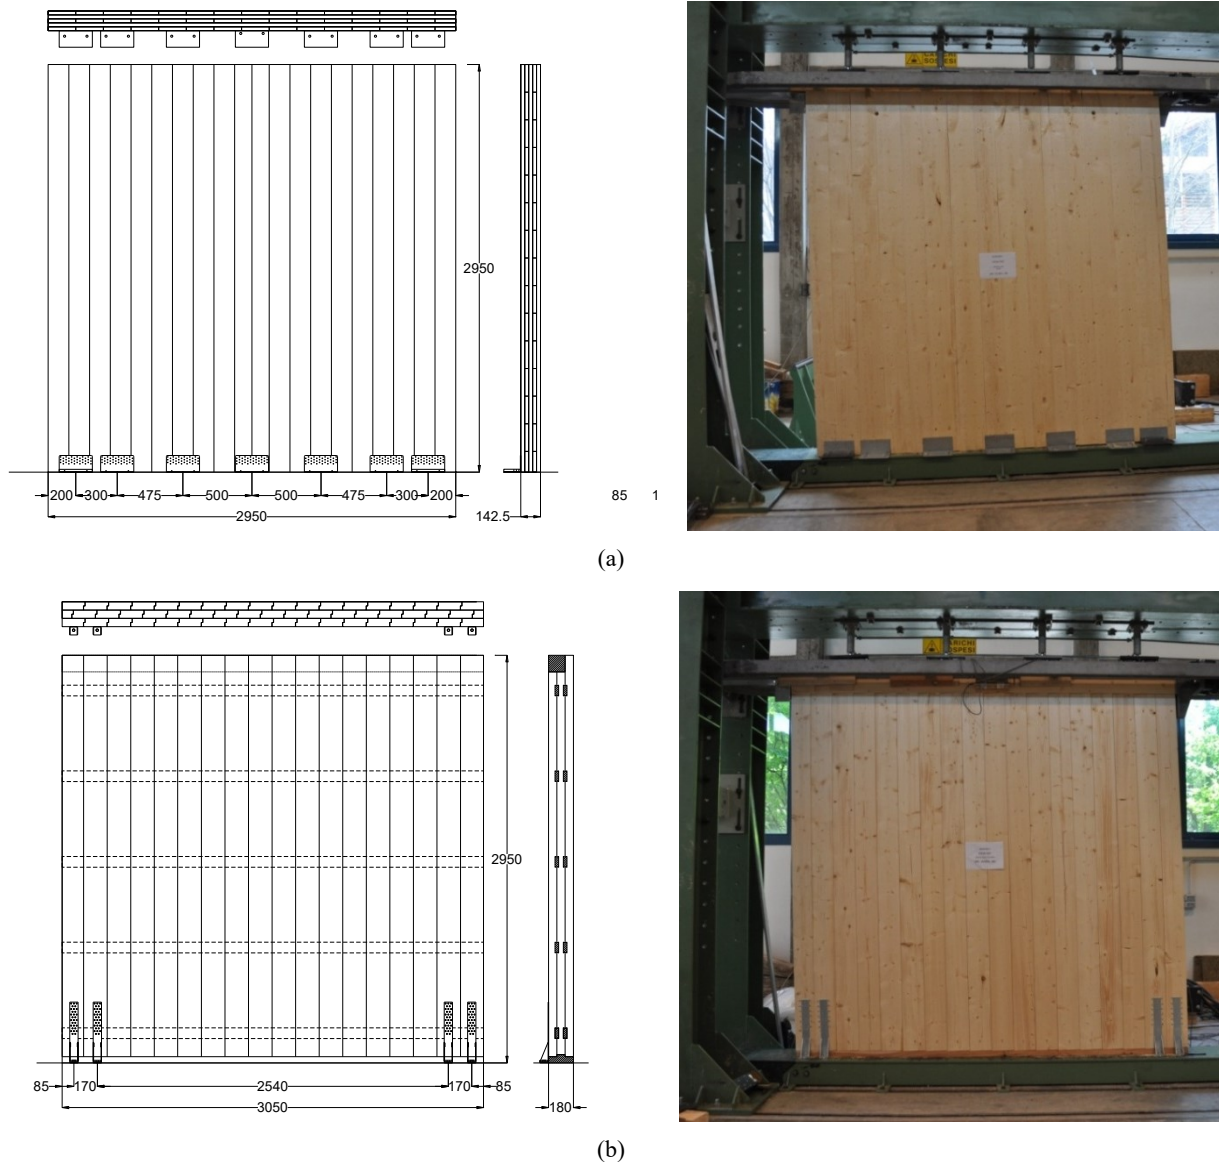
(a) Stapled wall; (b) layered wall. [4.20]
